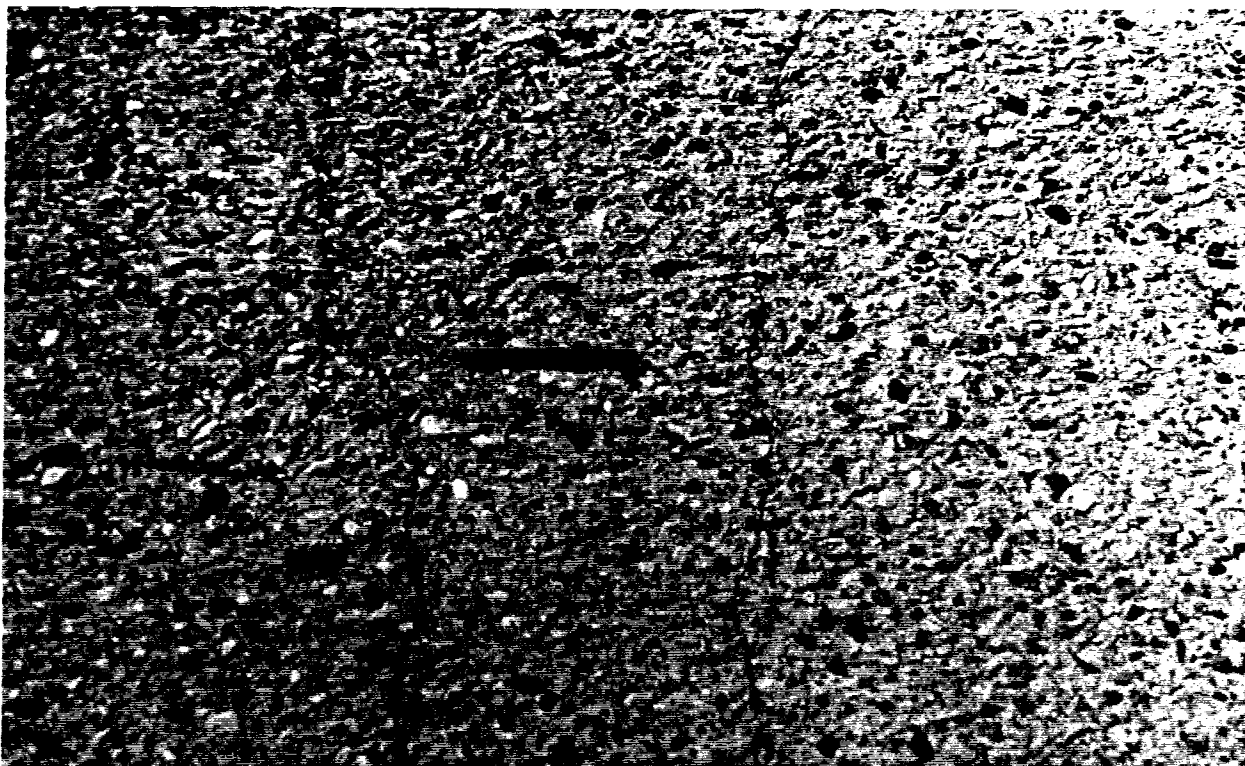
Surface of Colonial Parkway bridge (Figure 7). Exposed aggregate finish is used on parkway pavements.
